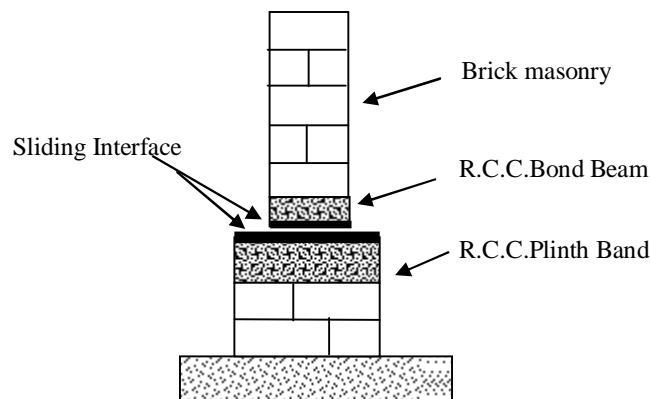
Construction detail for P-F isolation system in brick wall of a masonry building
